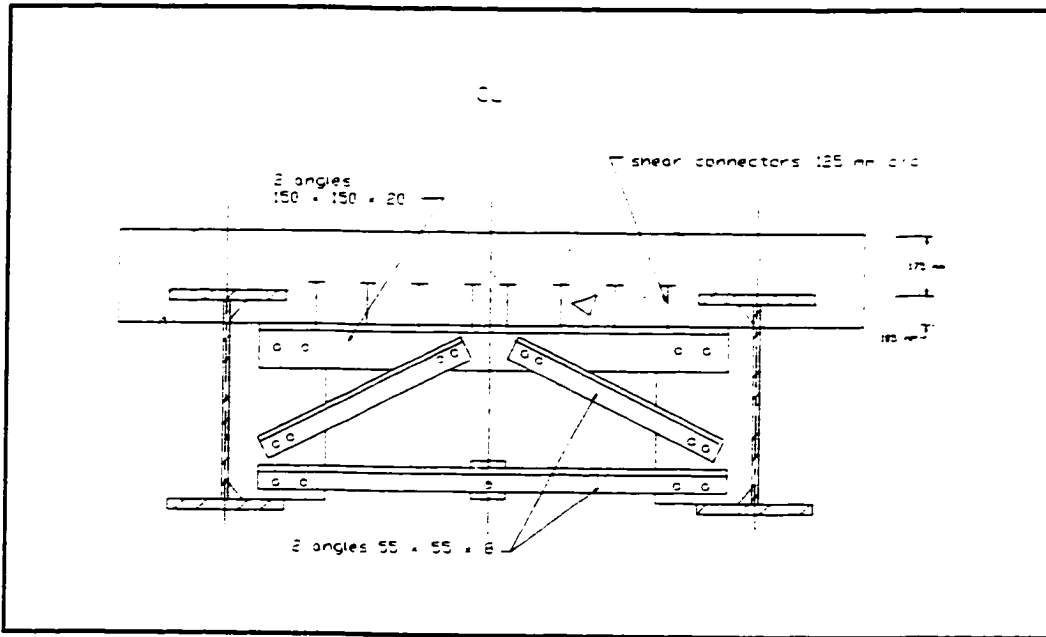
Layout of transverse diaphragm typical at the vertical supports
